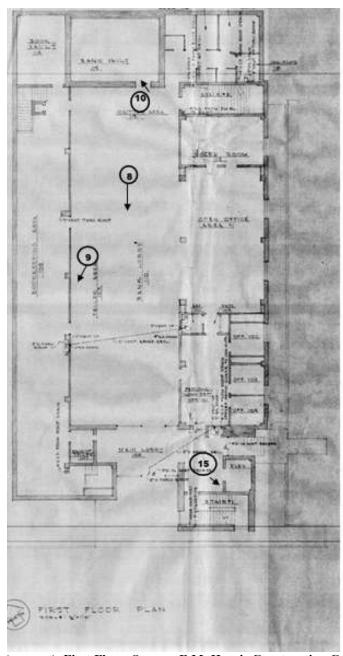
Floor Plan (current), First Floor. Source: E.M. Harris Construction Company, St. Louis, MO
